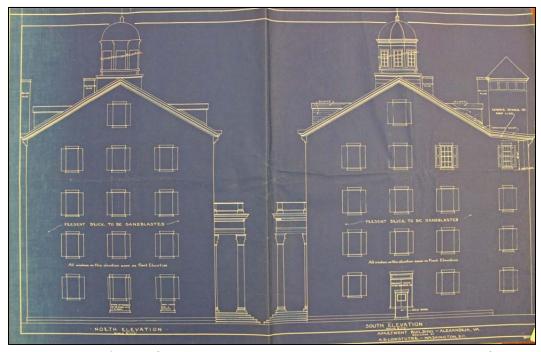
1935 A.B. Lowstuter's Design for Belle Haven Apartments. North and South elevations. Courtesy of Alexandria Local History Special Collections. Drawings note the installation of a new center door on the first floor of the south elevation and the conversion of two doors to windows on the north elevation, as well as demolition of the elevator tower to the height of the roof line.
